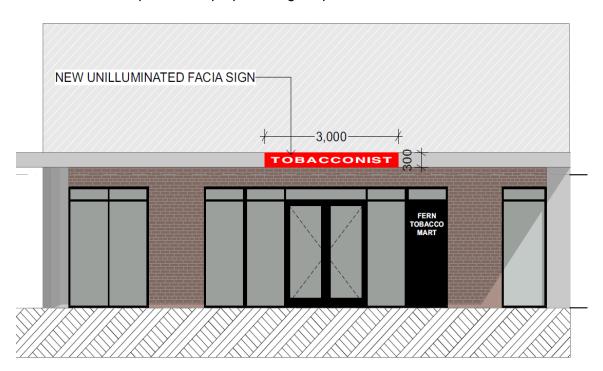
Proposed eastern elevation (viewed from Pitt Street)
